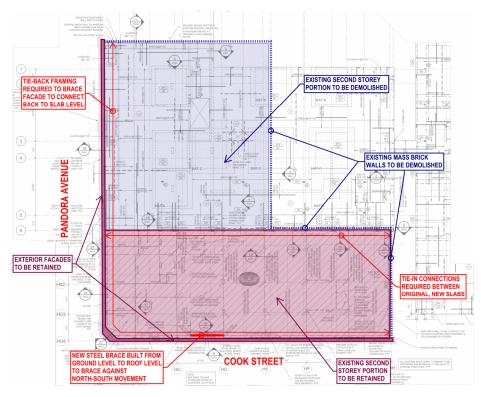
Second Storey Heritage Retention Plan (As Proposed by Developer)
